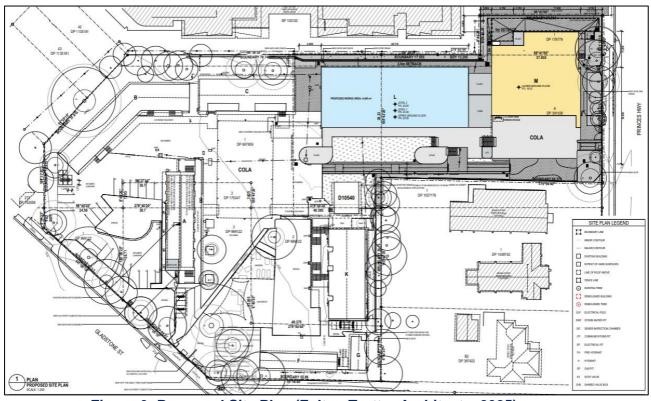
Proposed Site Plan (Fulton Trotter Architects, 2025)
